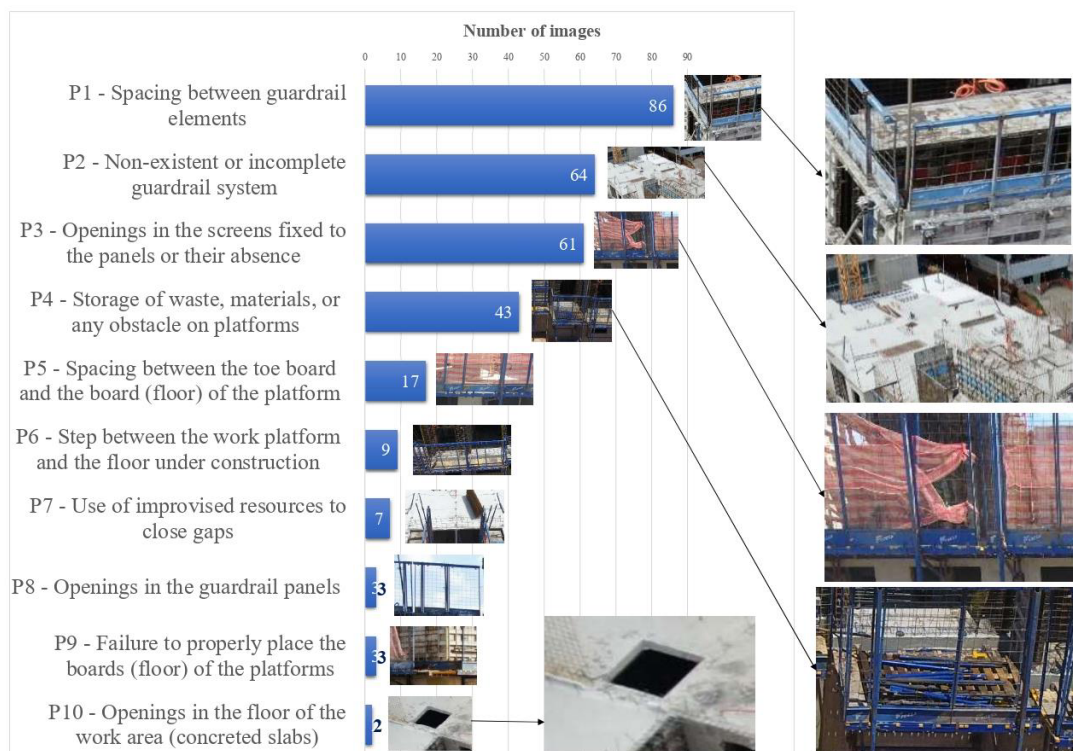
Types of Problems in Temporary Guardrail Systems and Work Platforms
